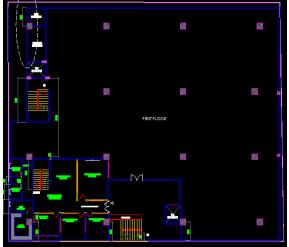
Plan of First Floor & second floor Table 1 Beam Details
